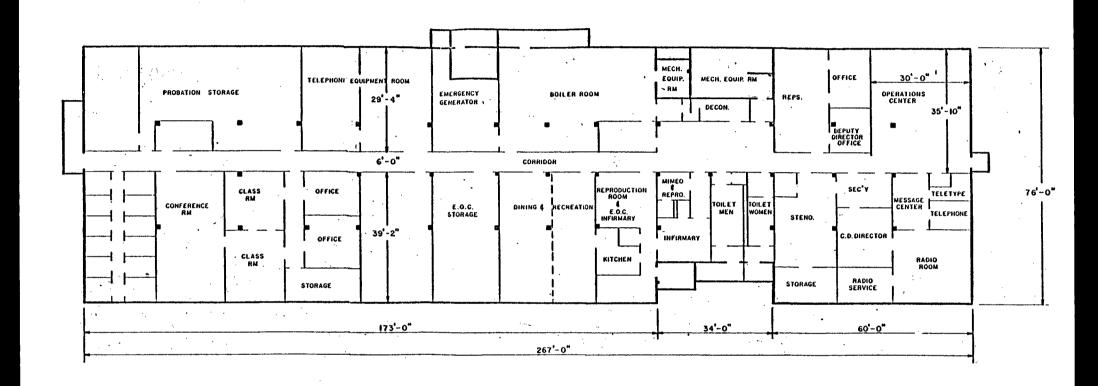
FIGURE EOC-I BASEMENT FLOOR PLAN BUILDING NO. C-110 YAPHANK, N.Y.
